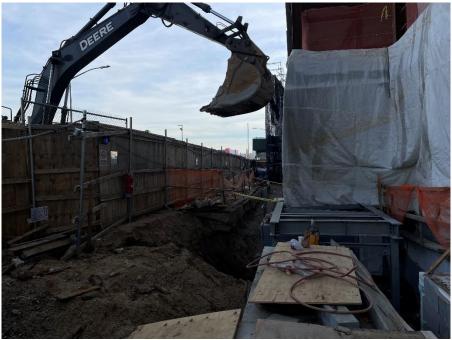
Bauer backfilling with imported clean fill from EROC in the northwestern part of the site (facing southeast)
